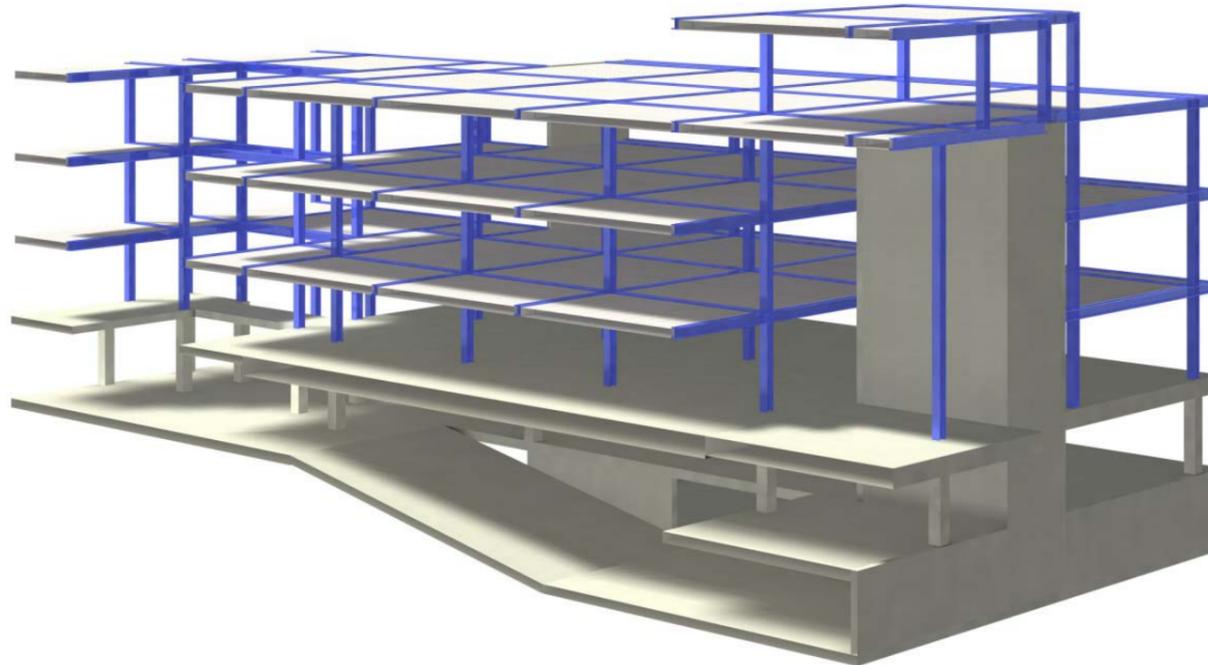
3D section through building - showing raked lecture theatre at ground floor
